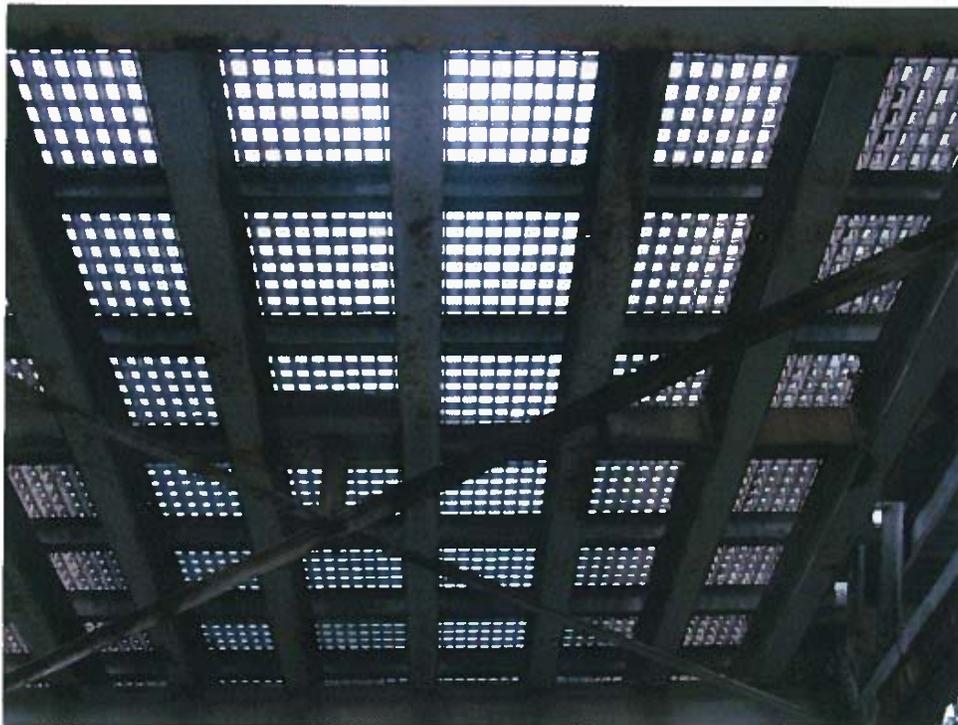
Typical condition of floor beams. Note: Welded reinforcement at the bottom flange.
